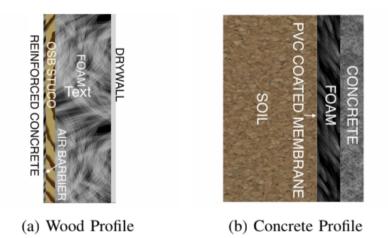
Thermal material profiles for a typical wooden residential structure and that of a concrete dome structure are shown.
